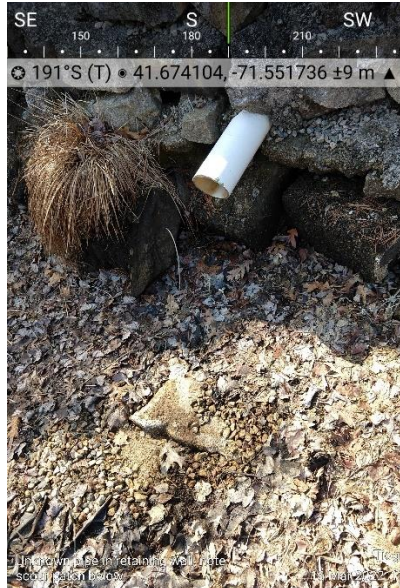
An unknown pipe in the retaining wall behind 62 W Shore Dr
